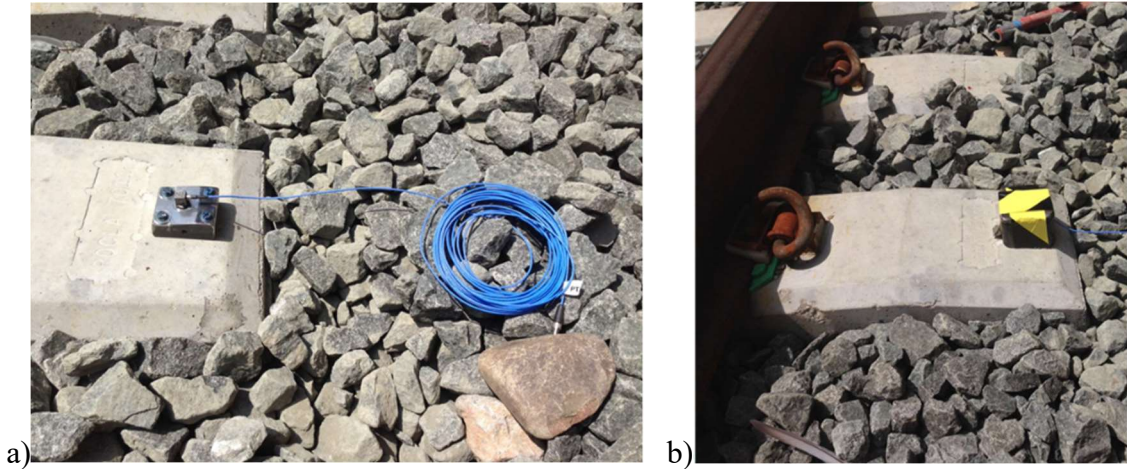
Portal triaxial accelerometer a) with levelling base, and b) fully enclosed
